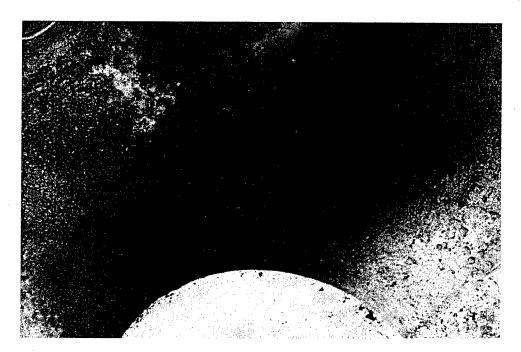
Spalling of 510-kg (1,125-lb) high-strength concrete underlayer units
